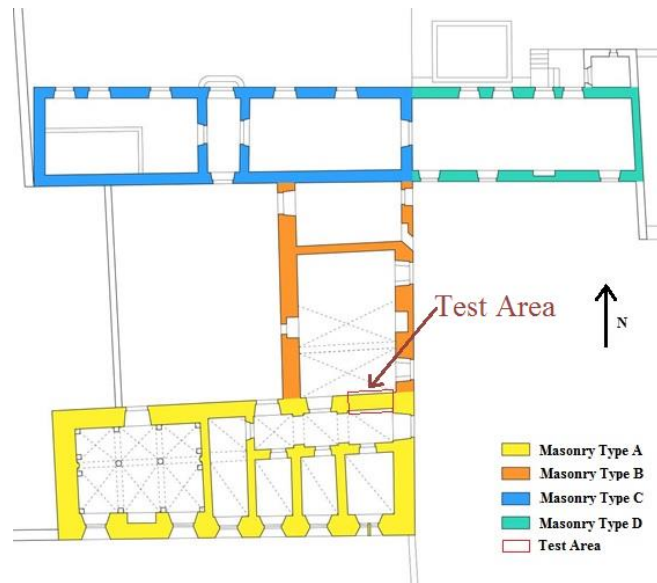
Main floor plan of the San Francisco Convent showing the four masonry types identified (image adapted from [69])
